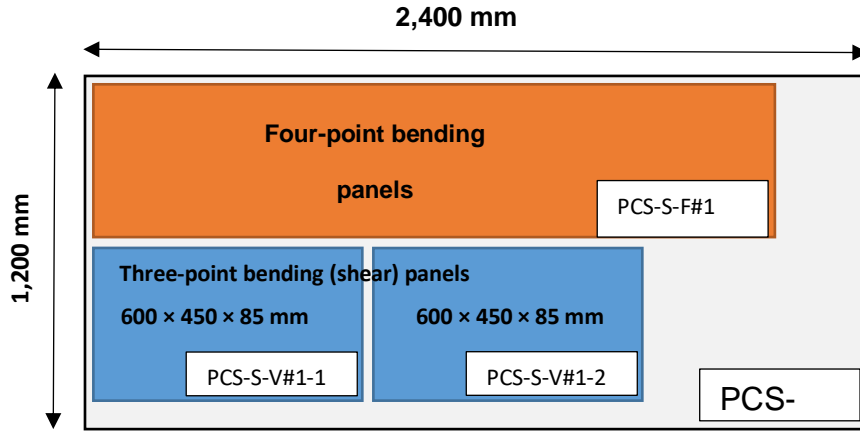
Cutting plan of the manufactured sandwich panels.
